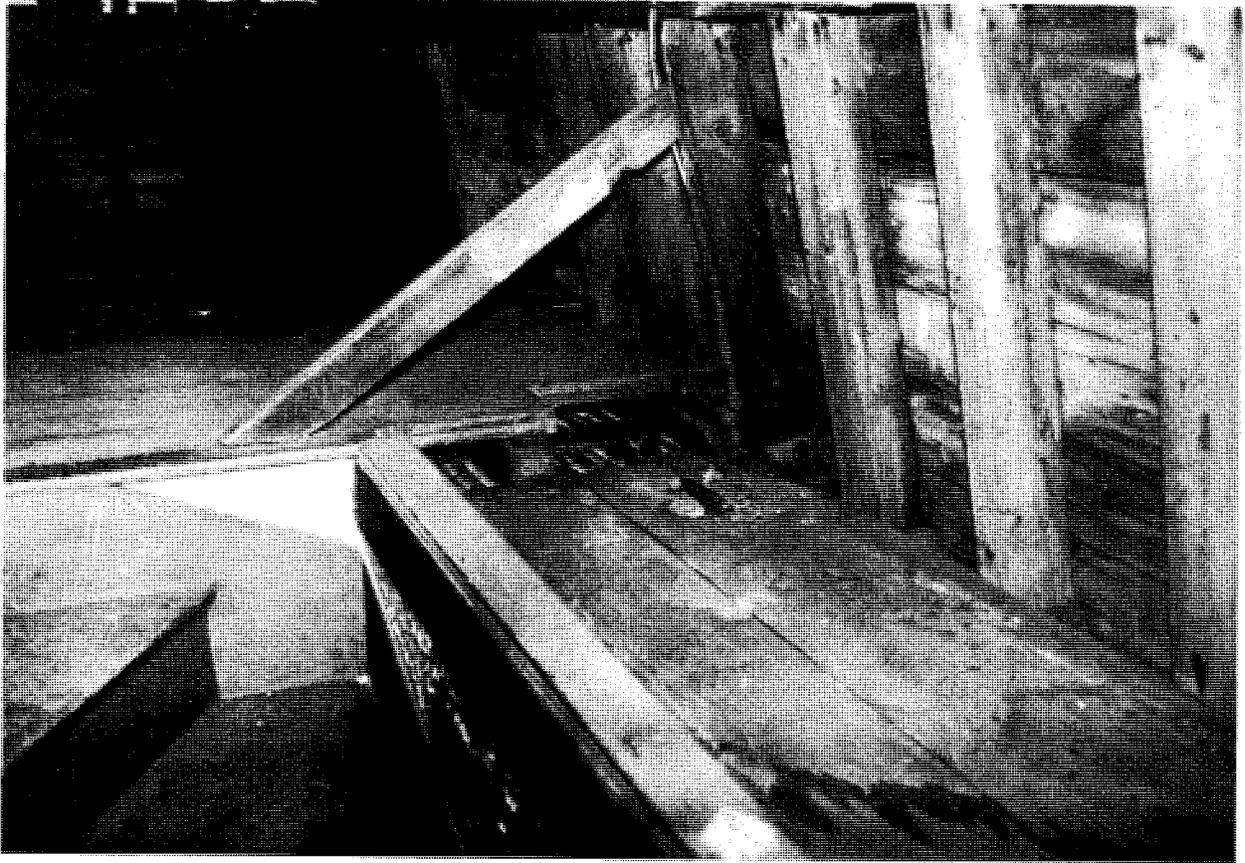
Penniman House: Unfinished Attic Space (Room 301),
